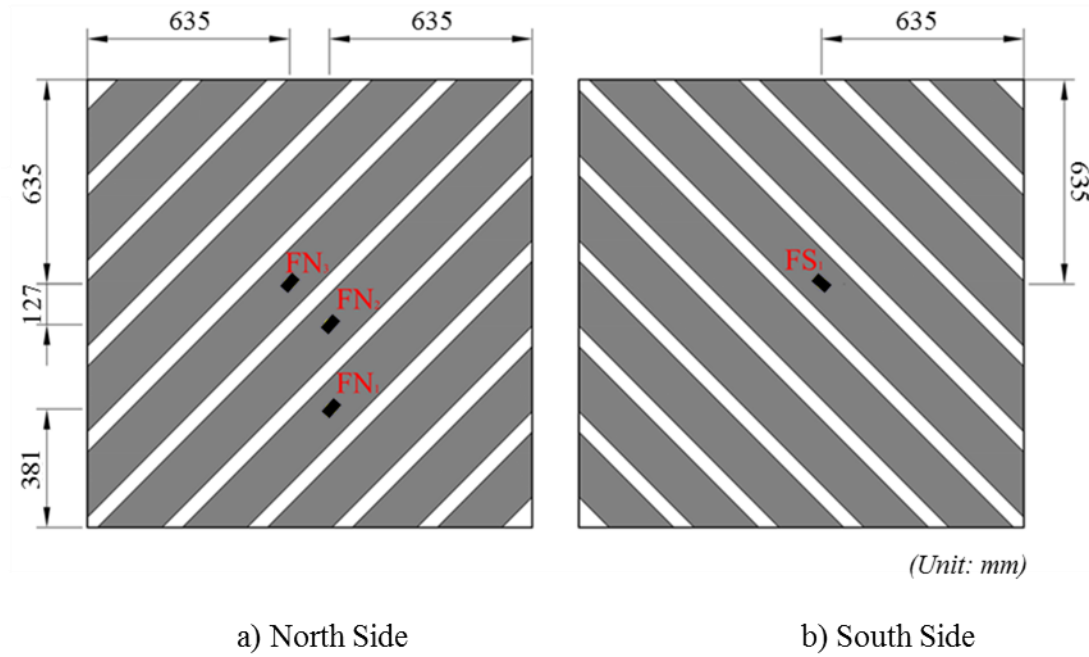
Strain gauge layout on FRP sheets of panel specimens
